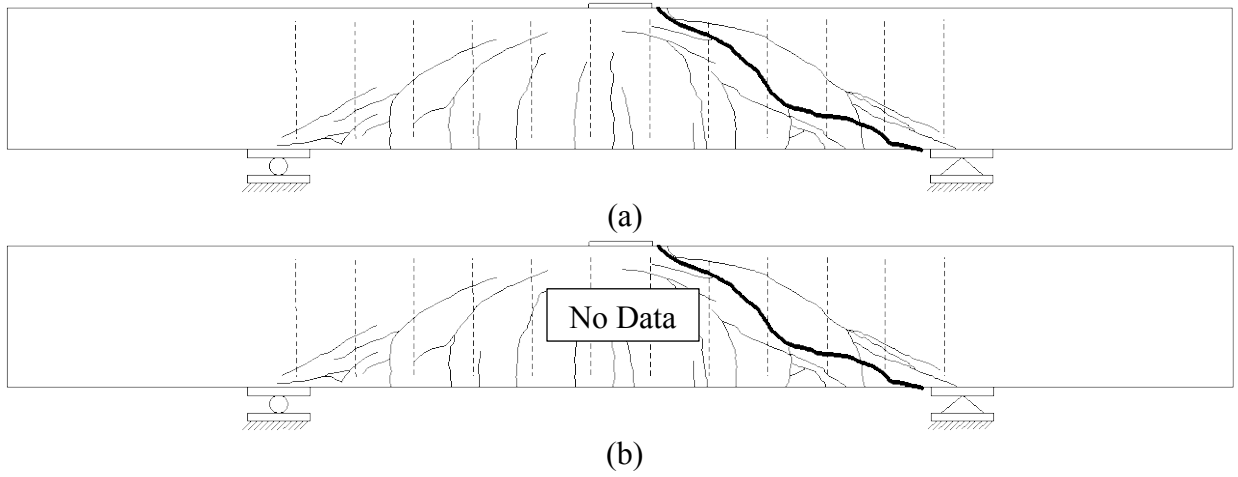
Observed damage in specimen P2S3, (a) front side, (b) back side
